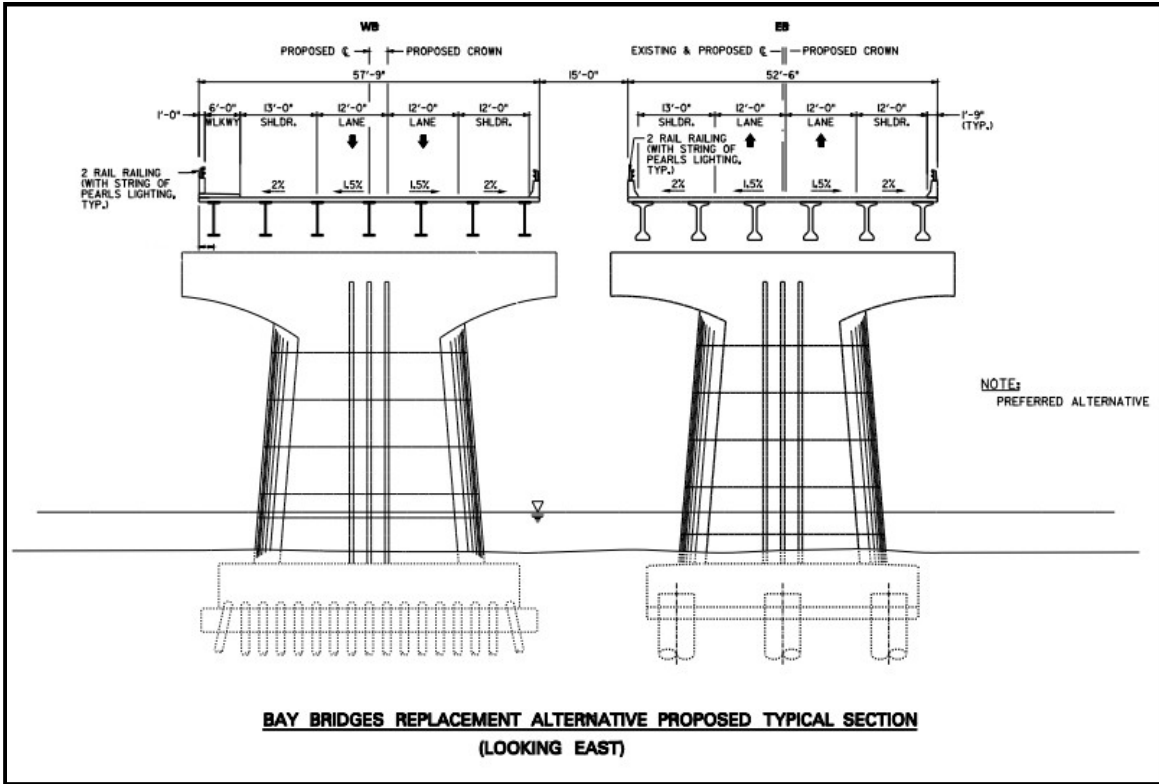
Bay Bridge Typical Section (Alternative 2 – Replacement)
